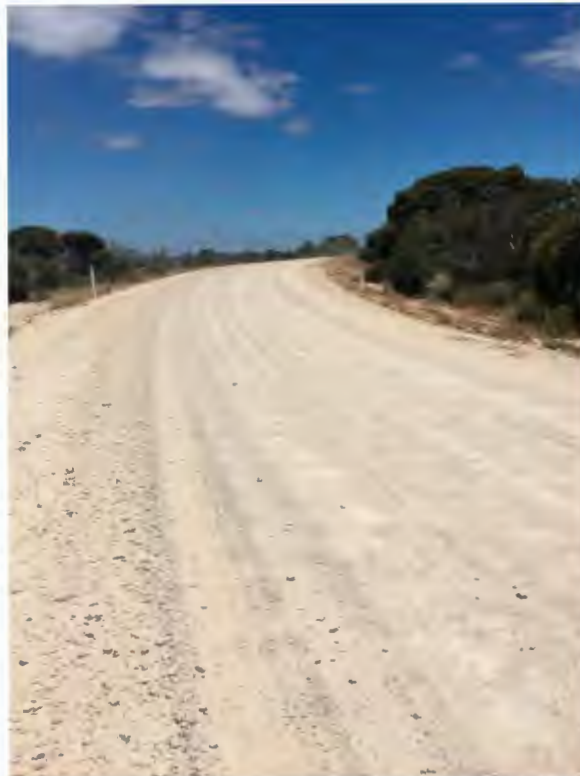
Item 20, typical cross-section of McBrides Road.
